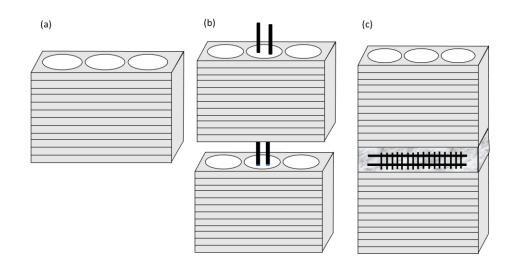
(a) A single wall panel with cavities/ provisions, (b) vertically joining with rebars, (c) Tie beams to connect the horizontal modules. The vertical reinforcement and the tie beams/ beams will be joining all the modules together
